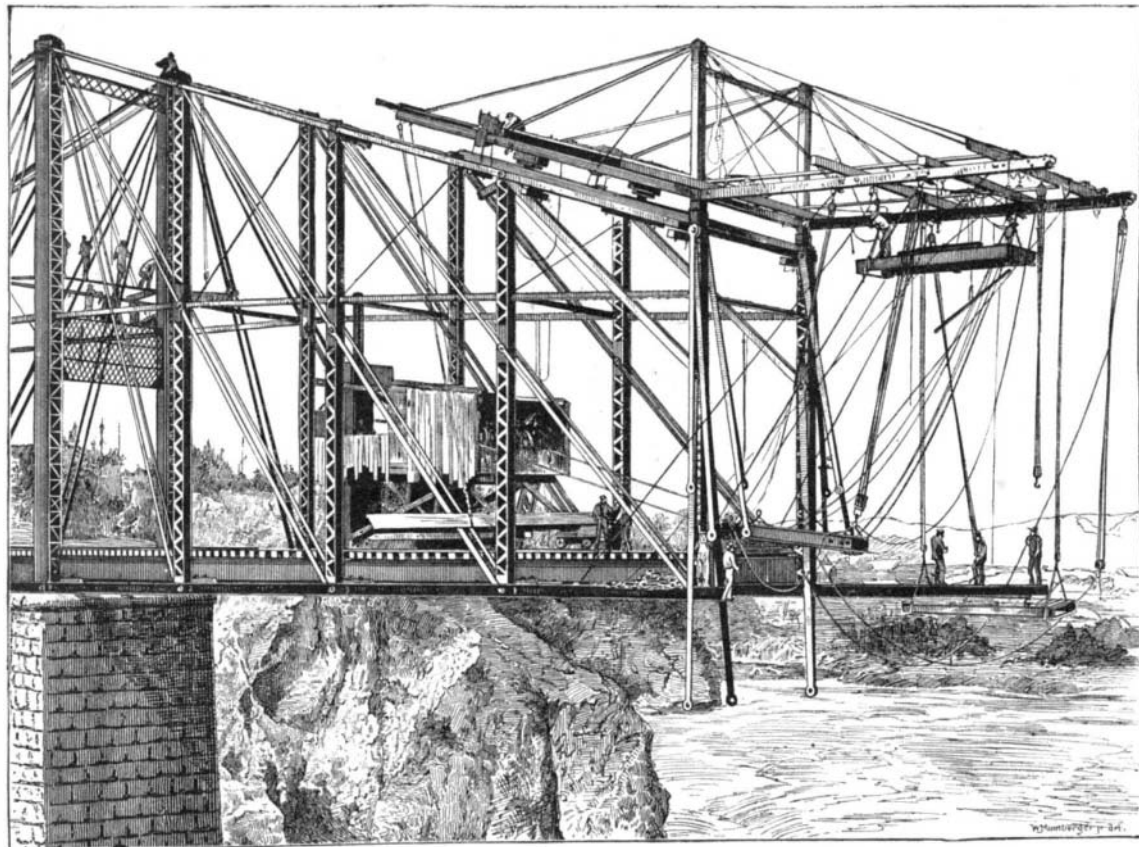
STEEL CANTILEVER BRIDGE AT ST. JOHN.—PROCESS OF ERECTION AND PLANT.
